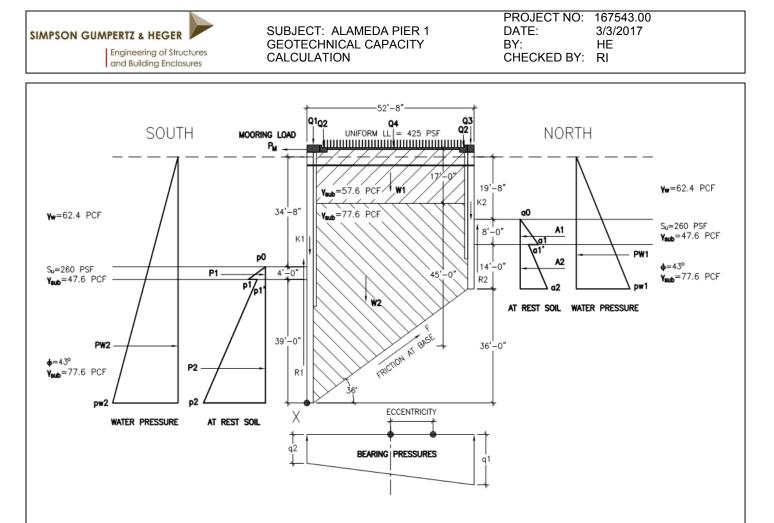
Pier 1 Segmental Cofferdam External Loads and Reactions with 425 psf Uniform Live Load.
